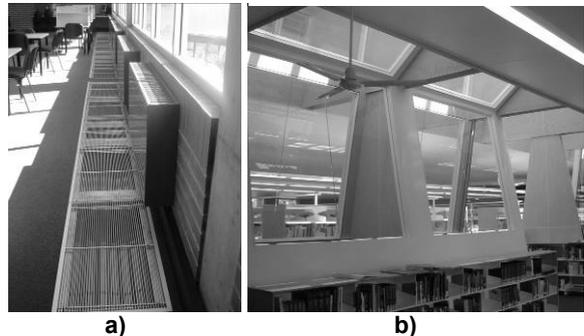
Photograph of; a) first floor air inlet louvres on the eastern side of the building. Note the early morning sun penetration, b) Clerestory above the library resource area. Note the ground floor flues are connected directly to outdoors to prevent short circuiting with the first floor.
